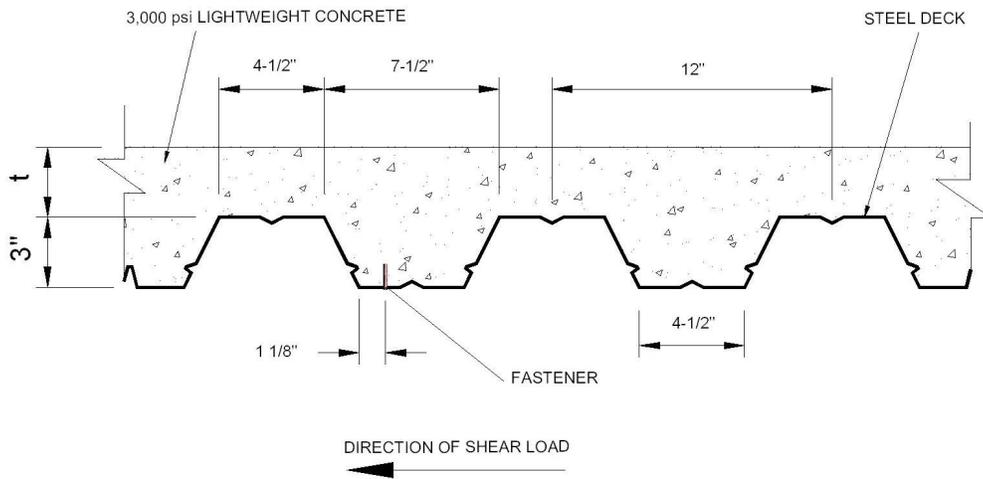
FASTENER INSTALLATION SAND-LIGHTWEIGHT CONCRETE FILLED “W3” STEEL DECK
